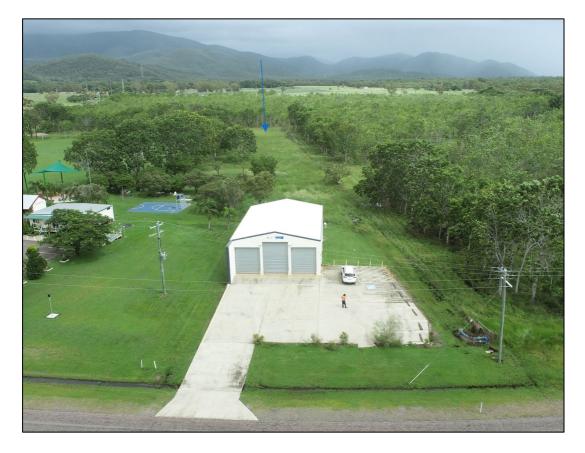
Aerial view looking north towards the facility location from Community Cres
